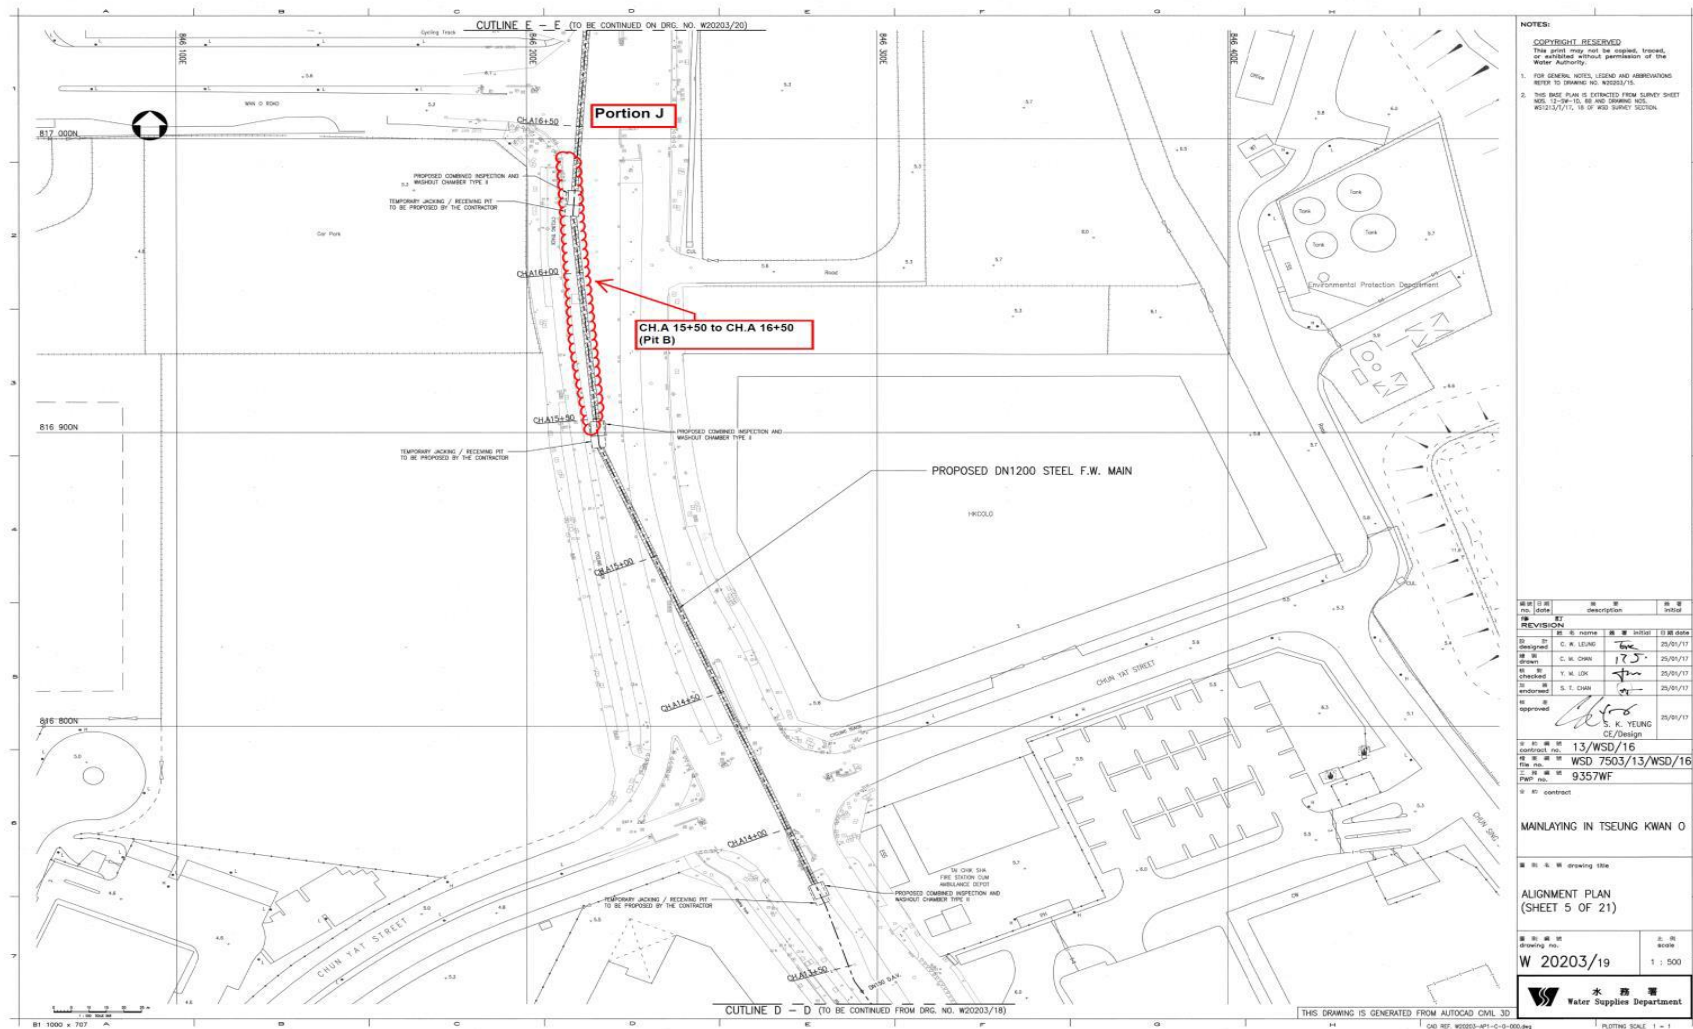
Location Plan for Portion J – CH. A15+50 to CH.A 16+50 (Pit B)
